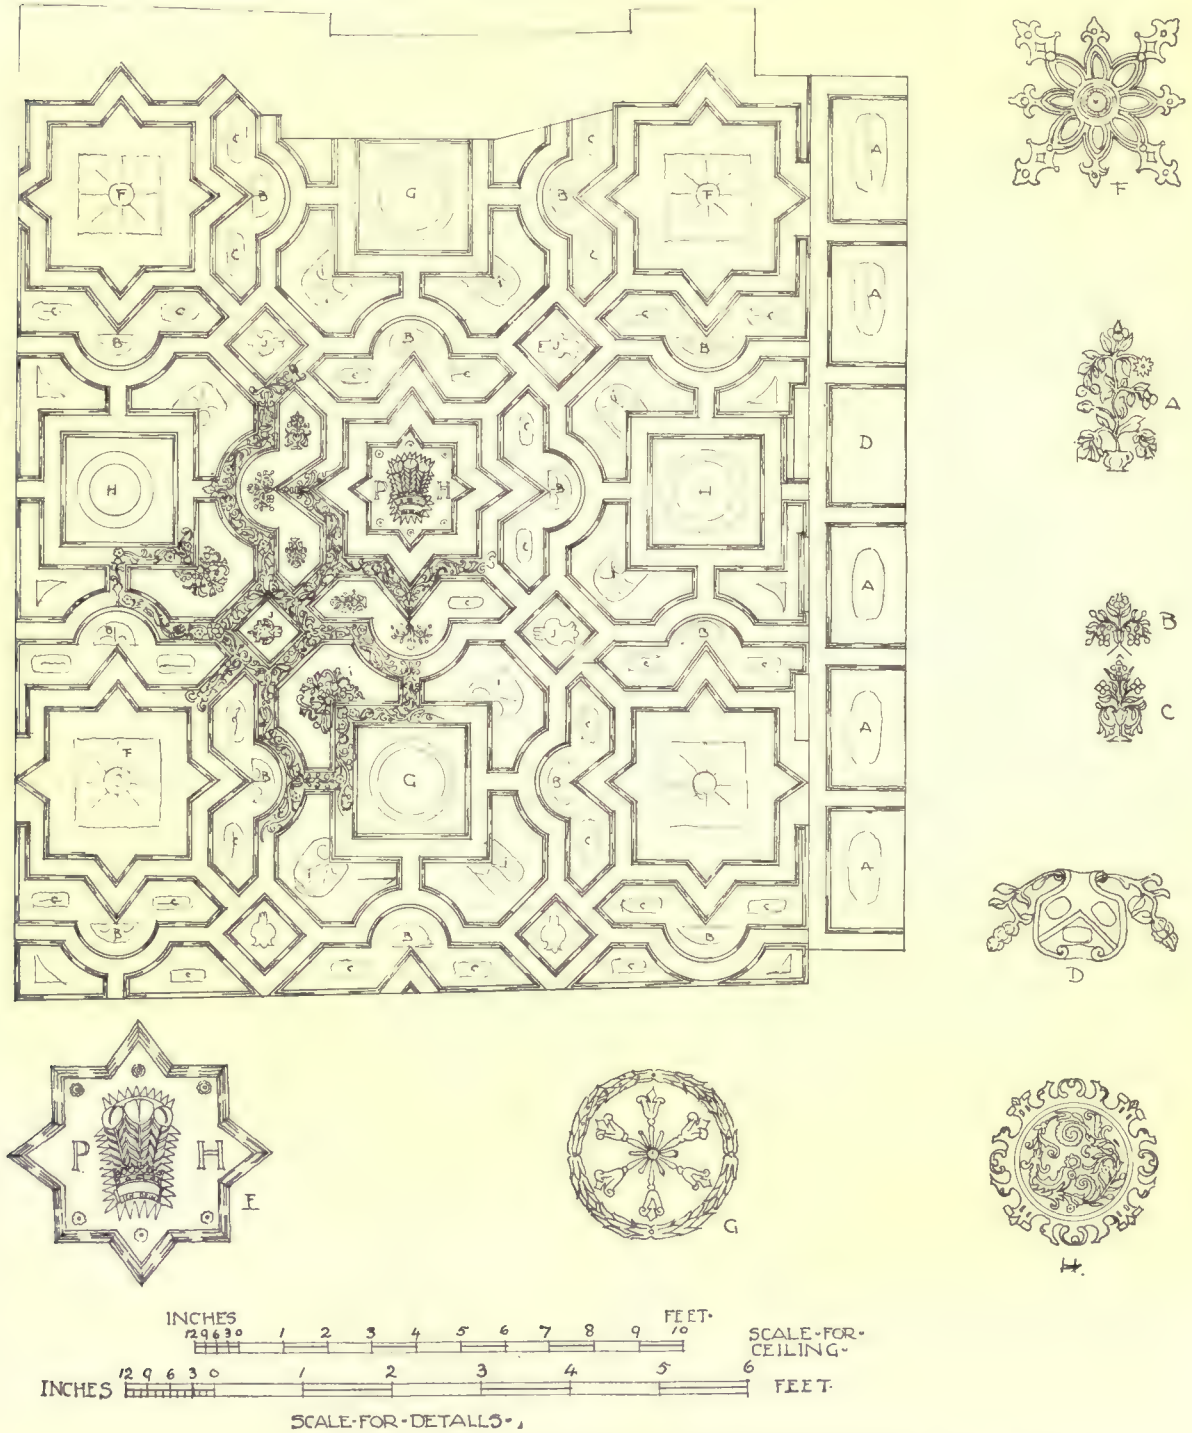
First Floor Room, No. 17 Fleet Street, London.
